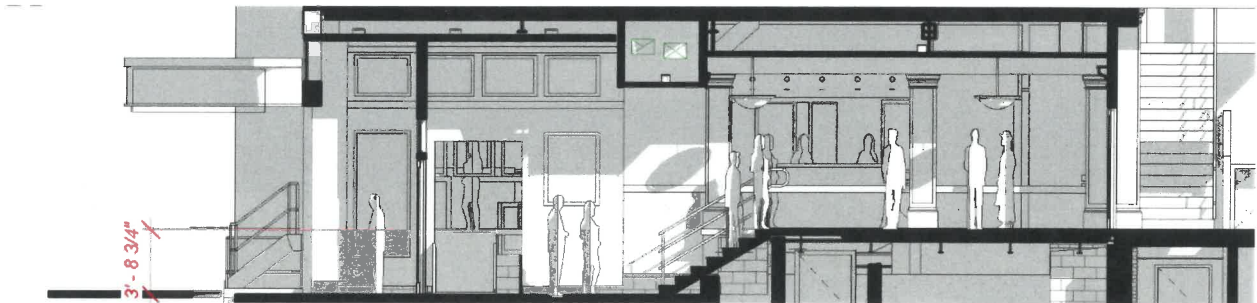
Proposed Lobby provide level access to wheelchair lift and then to elevator
